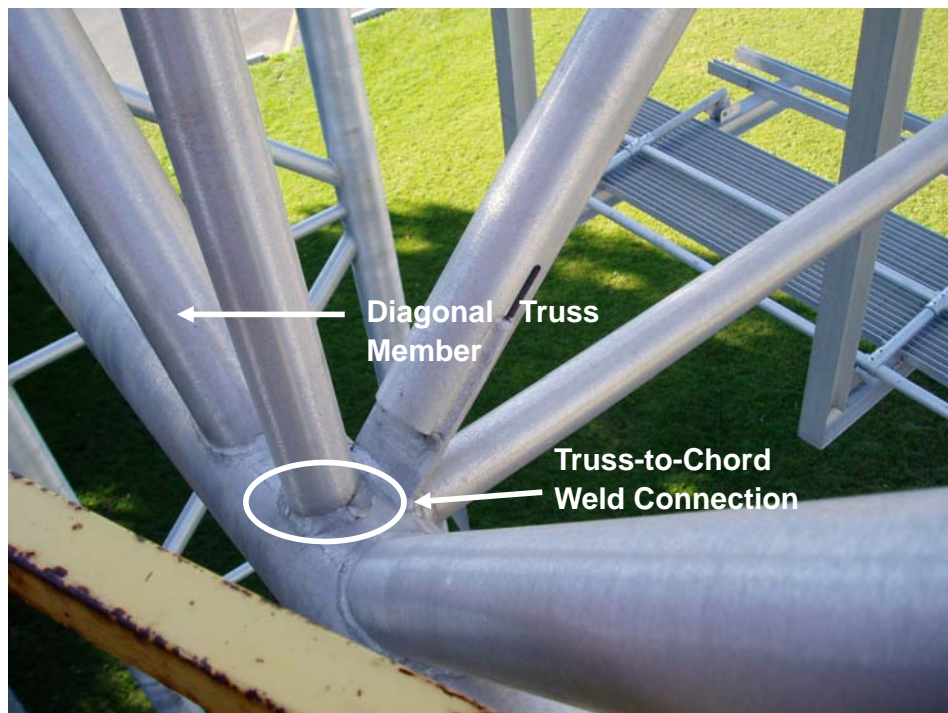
Truss-to-chord weld connection for a box-truss sign structure.
